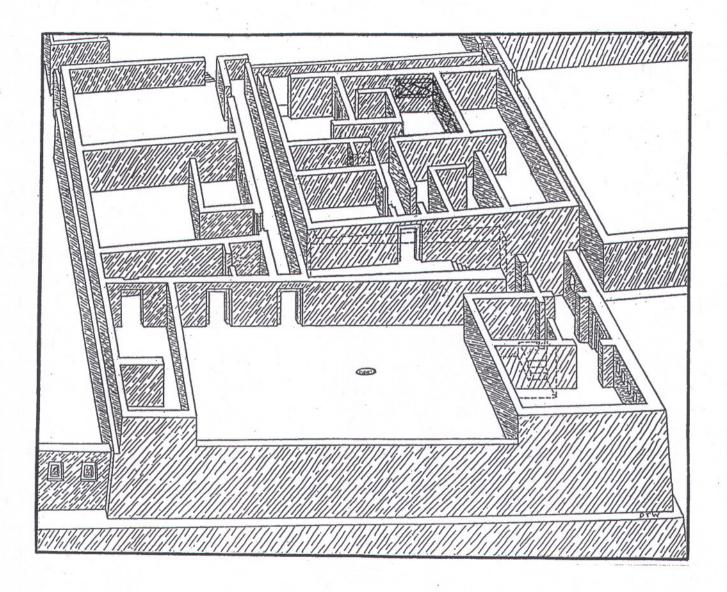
The Inca compound's west end reconstructed, with the veranda front and center. The raised room entrance is via the stairway at the right and along the raised walk. The dotted lines show a probable balustrade or wall, making the access from the door to the lower southwest rooms more private. Gradual widening of this wall would make the west end of the raised block appear parallel to the outer veranda balustrade. A sunken bath with steps and drain is at the right. The niches in this corner room cluster include a tall one, marking an elite function.
